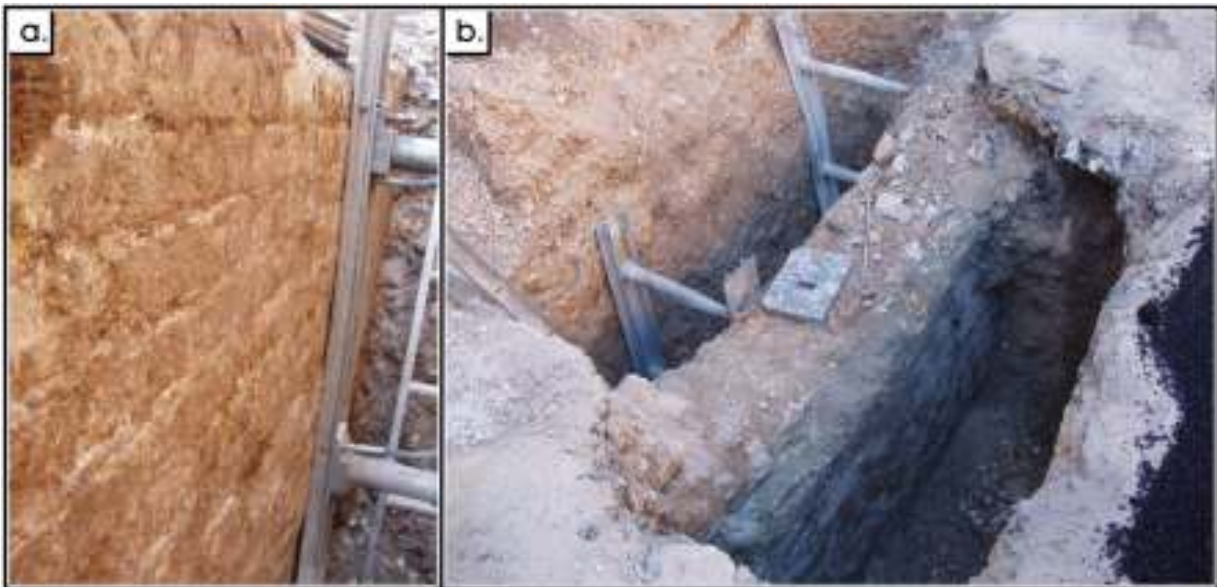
a) Yellow brick wall exposed by backhoe trench; b) T-1 is on the left, and T-2 is on the right of wall.
